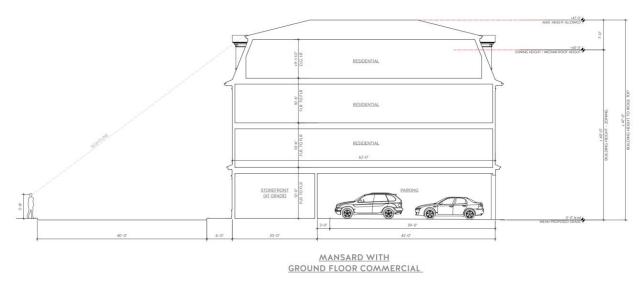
Proposed 40' Building Height for the Mixed-Use Hanover Street Building
